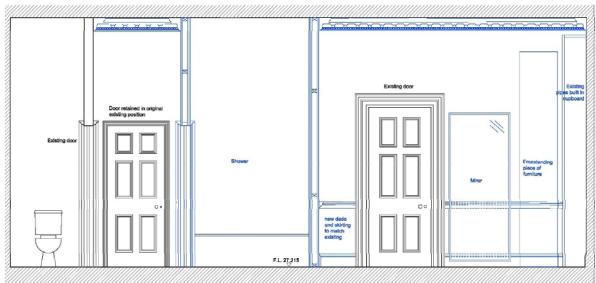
Master Bedroom lobbies elevation The entrance lobby receives a full height mirror and a freestanding piece of furniture and provides the Looking East opportunity to be used as a small dressing room.
